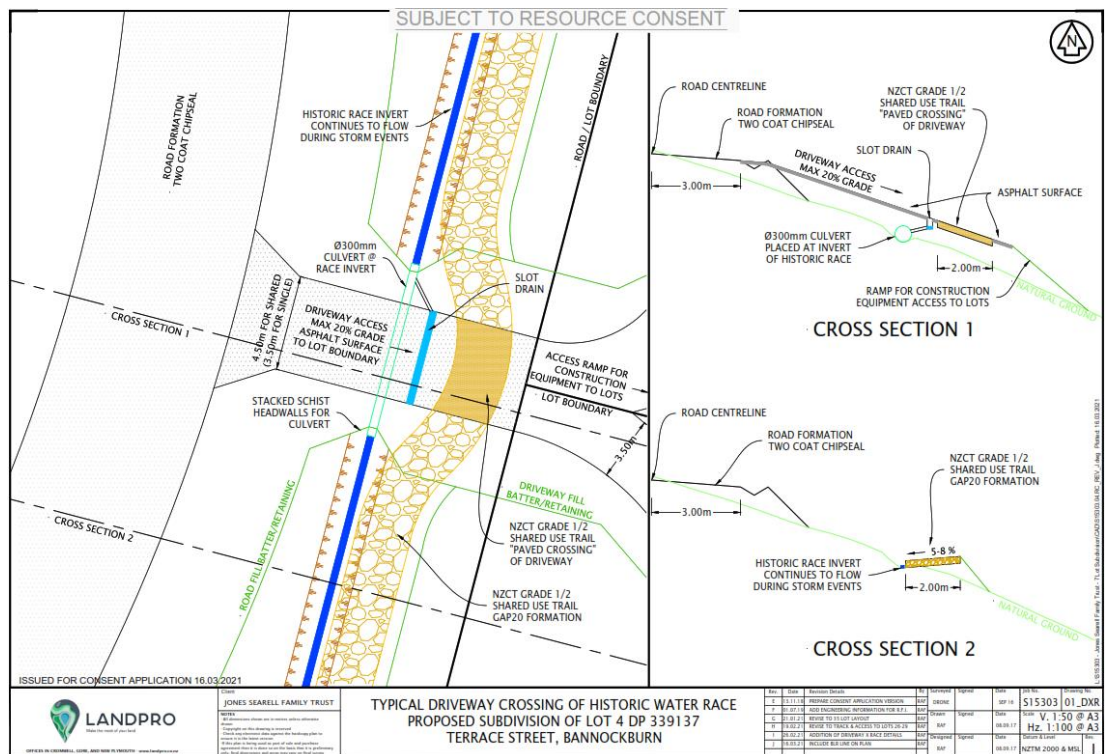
Proposed Steep ROW water race crossing detail (Landpro Plan s15303_01_DXR_Rev_J)
